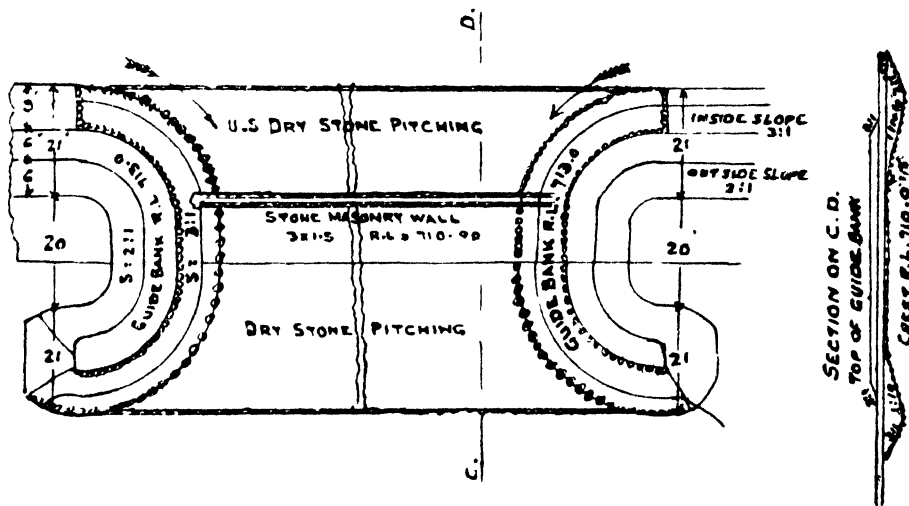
Plan of waste weir on Bhond Scale 1/200
